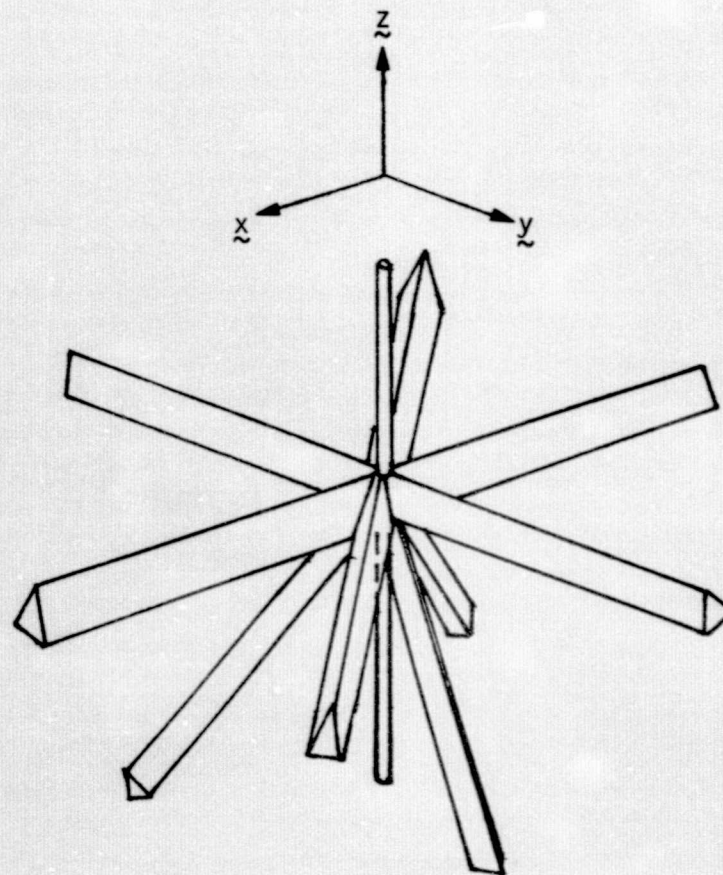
Modified Tetra Truss Beam Intersection with Tubular Mount
